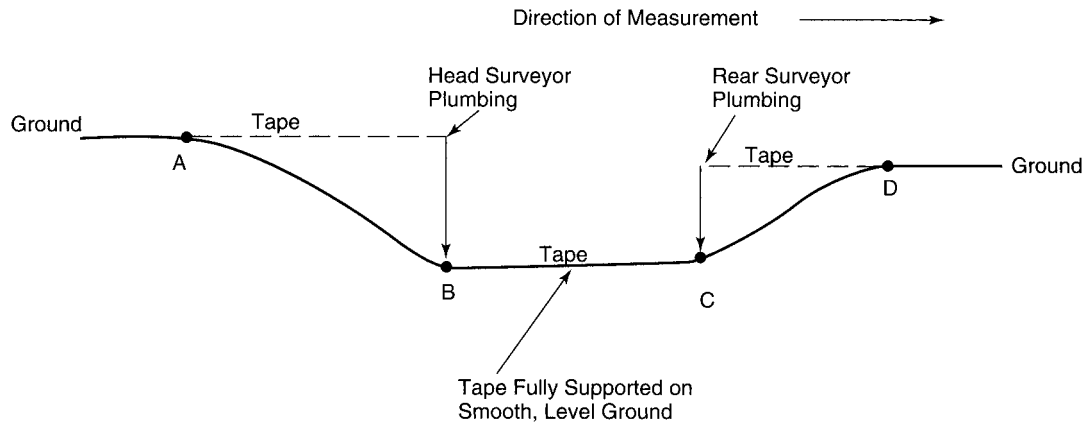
Horizontal taping; plumb bob used at one end.
